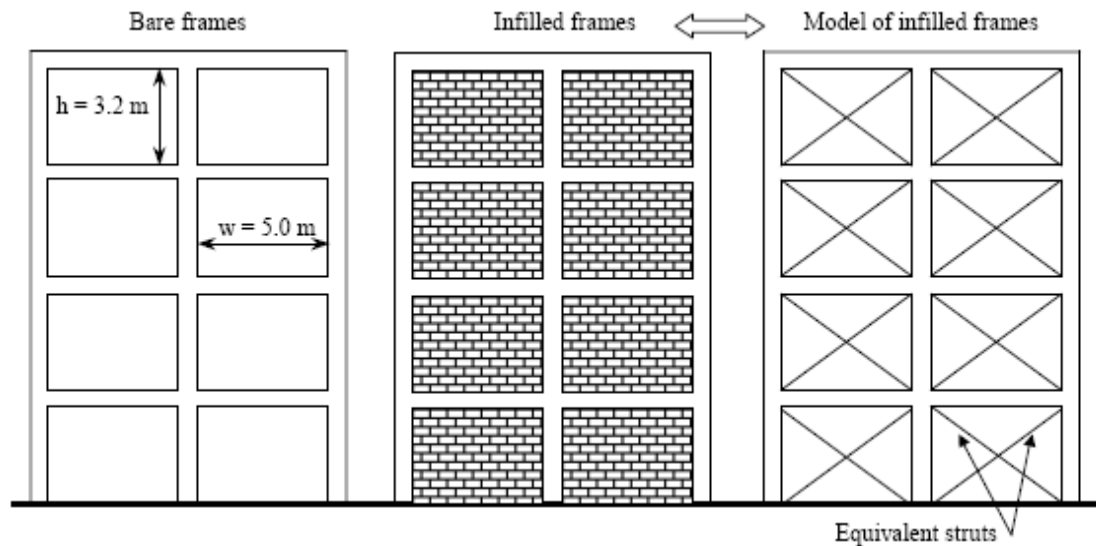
Structural layout of bare and infilled frames (DeCanini, 2004)
